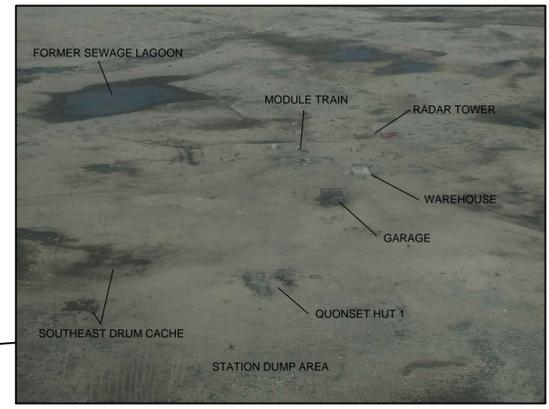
OVERVIEW OF AREA 1 MAIN STATION AREA WITH REMAINING INFRASTRUCTURE, FACING WEST
